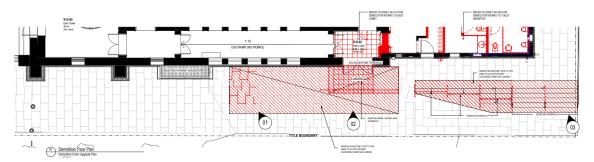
Extract from Demolition Plan of St. Michael's Walk Entrance. Source: Trethowan Architecture, 2024.
